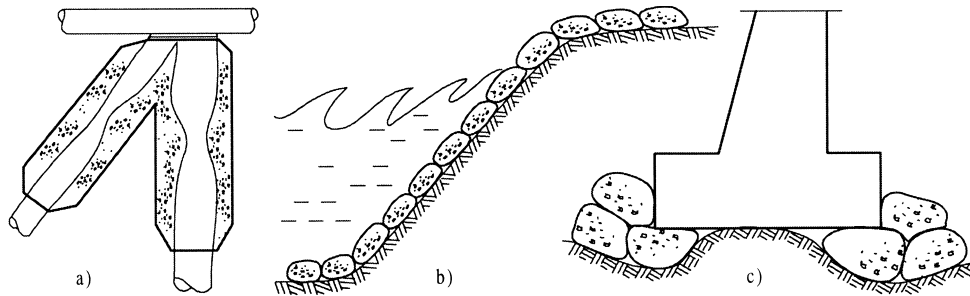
Examples of fabric forms applications: (a) pile jacketing, (b) erosion control surface, and (c) bridge pier unclear pinning.
